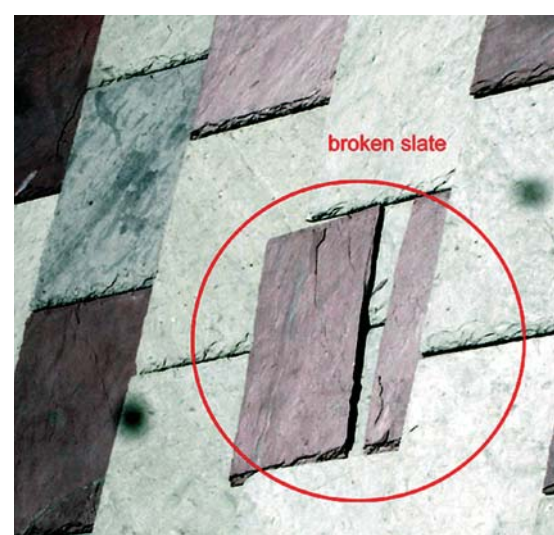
(above): Slate roofs that are walked on during installation will shed slates after the roof has been installed, perhaps for years.
